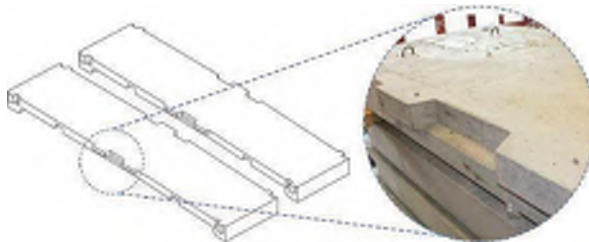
Shear keys in a dry deck joint in a large-scale test specimen
